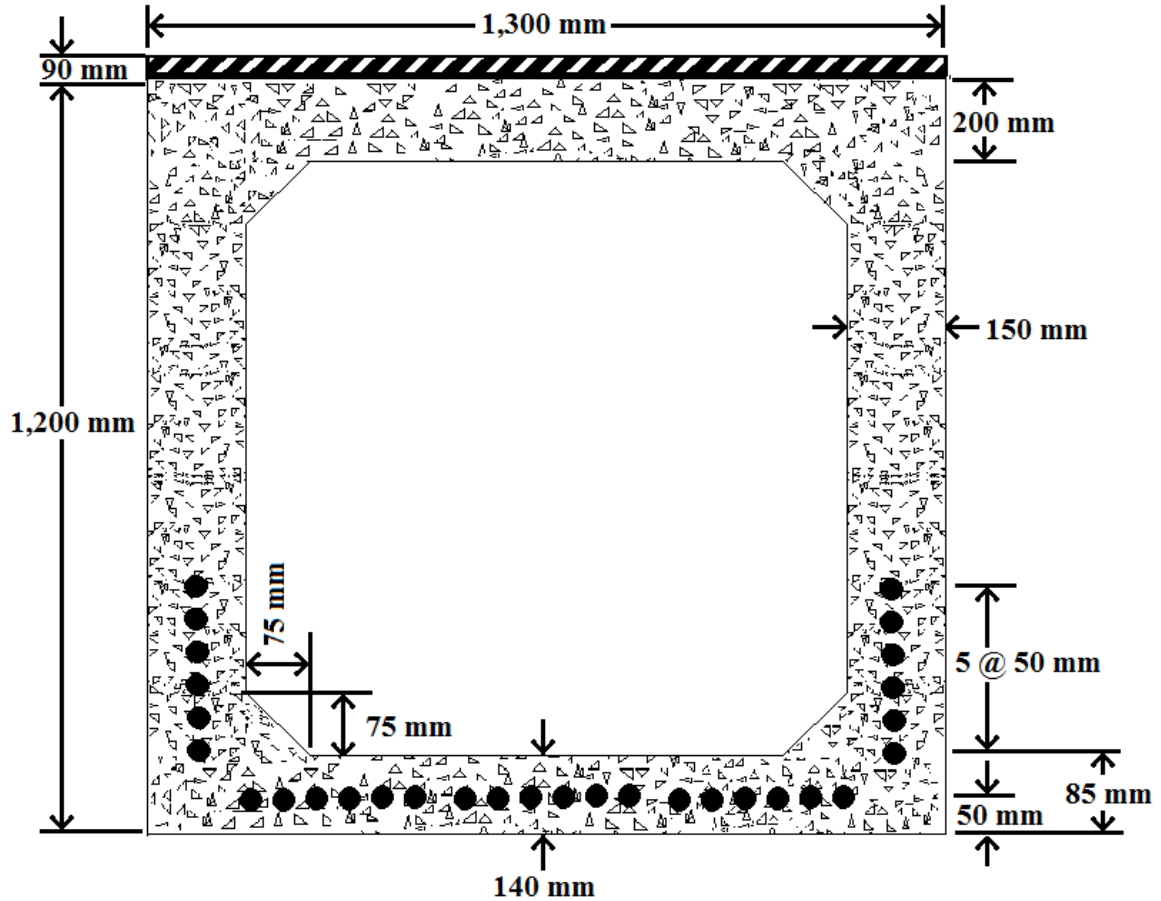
Cross section of interior girder at mid-span, 30.8 m pre-stressed box-girder
